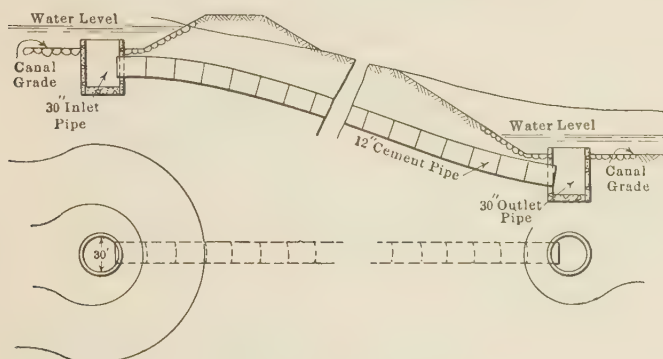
Typical pipe chute with 30-in. special pipes for inlet and outlet. Umatilla Project, Ore.
